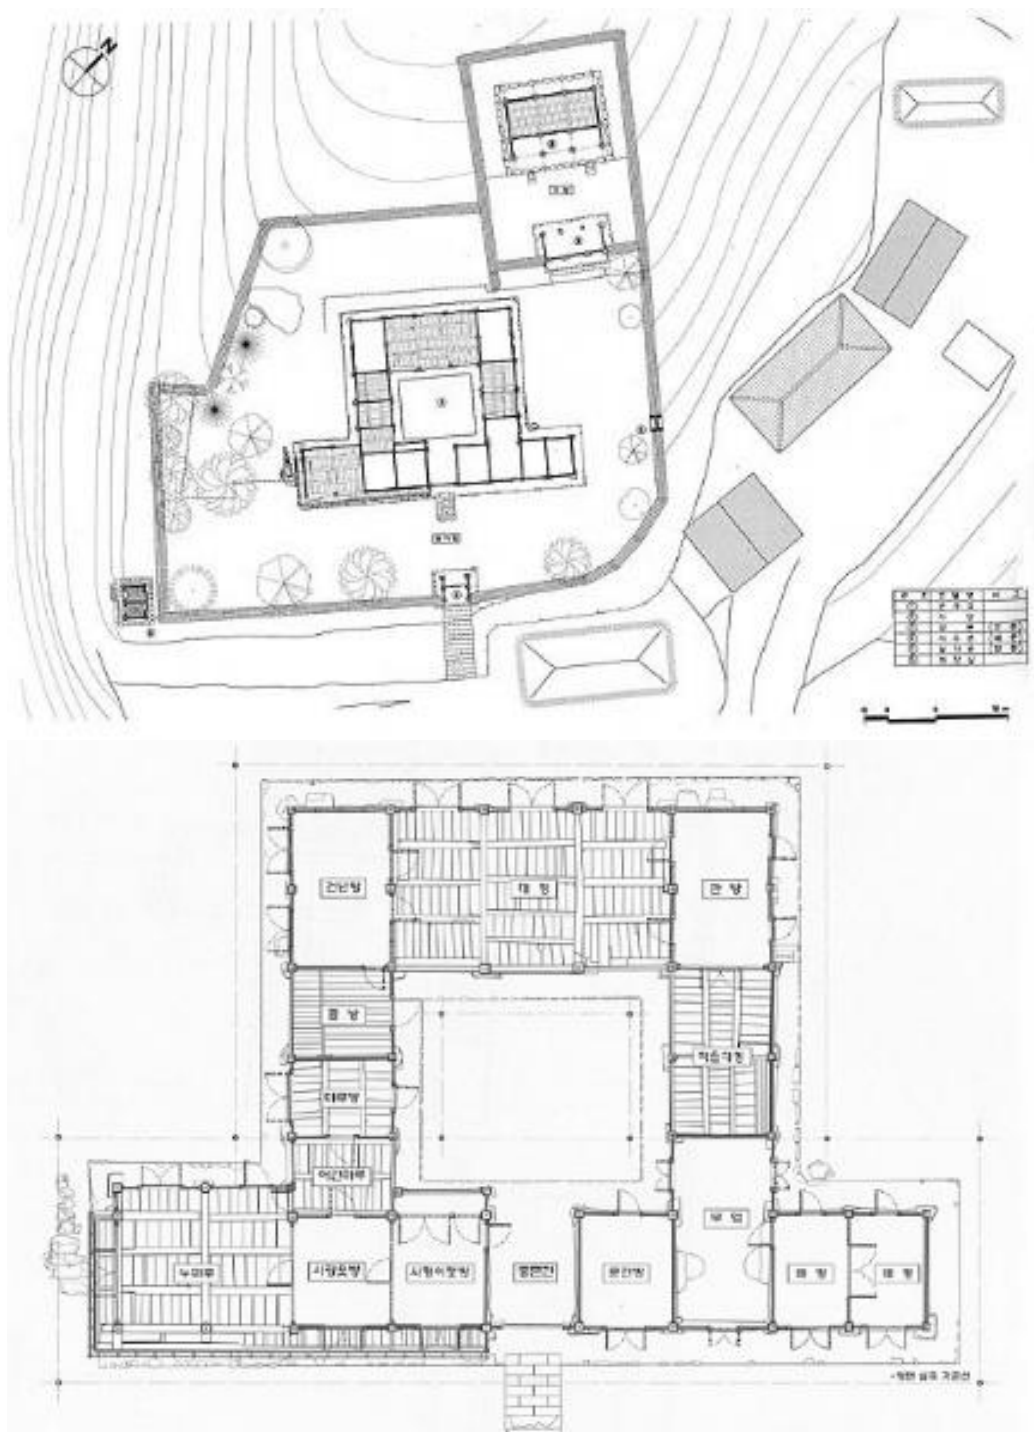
Site Plan and Floor Plan of Kwangajeong
